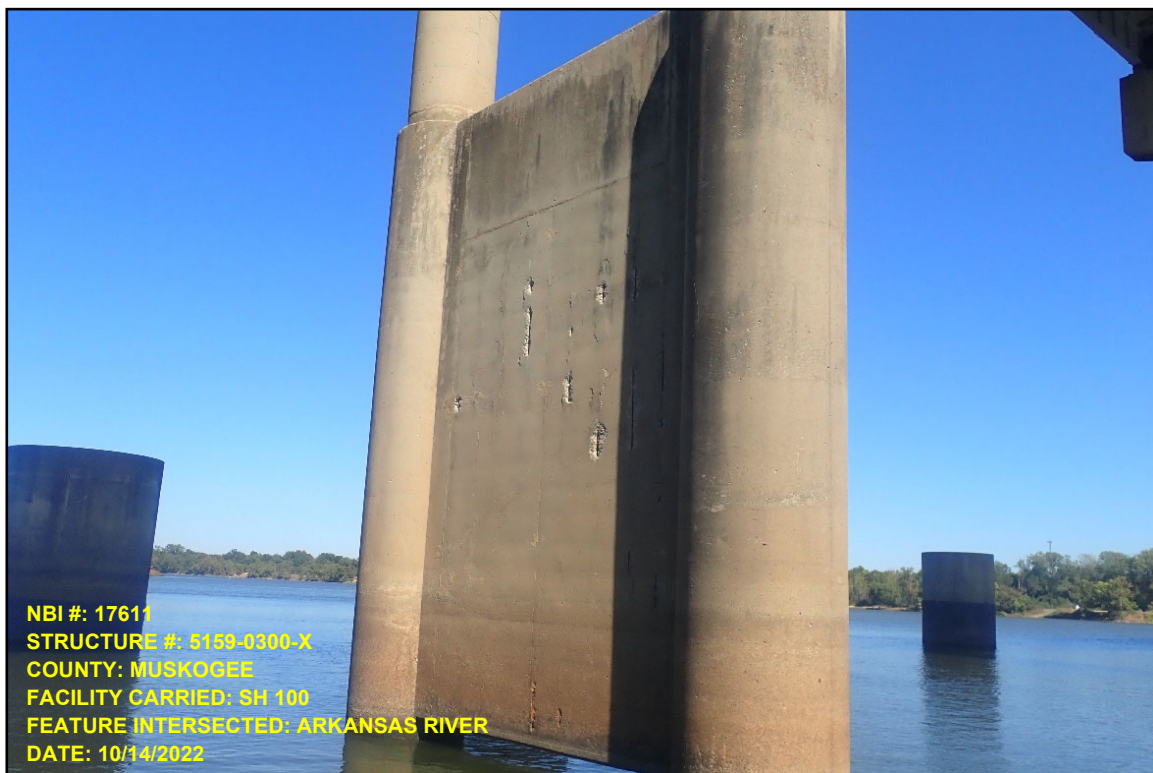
Pier 3, Webwall, Spalls w/Exposed Steel
